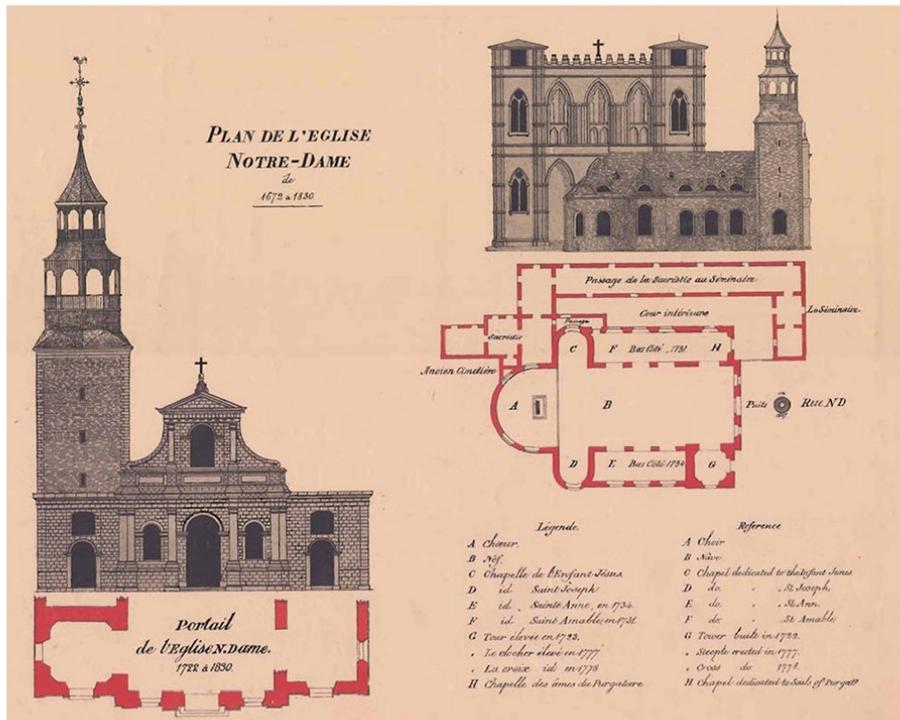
Elevation and plan of Montreal Basilica 1722-1830.
